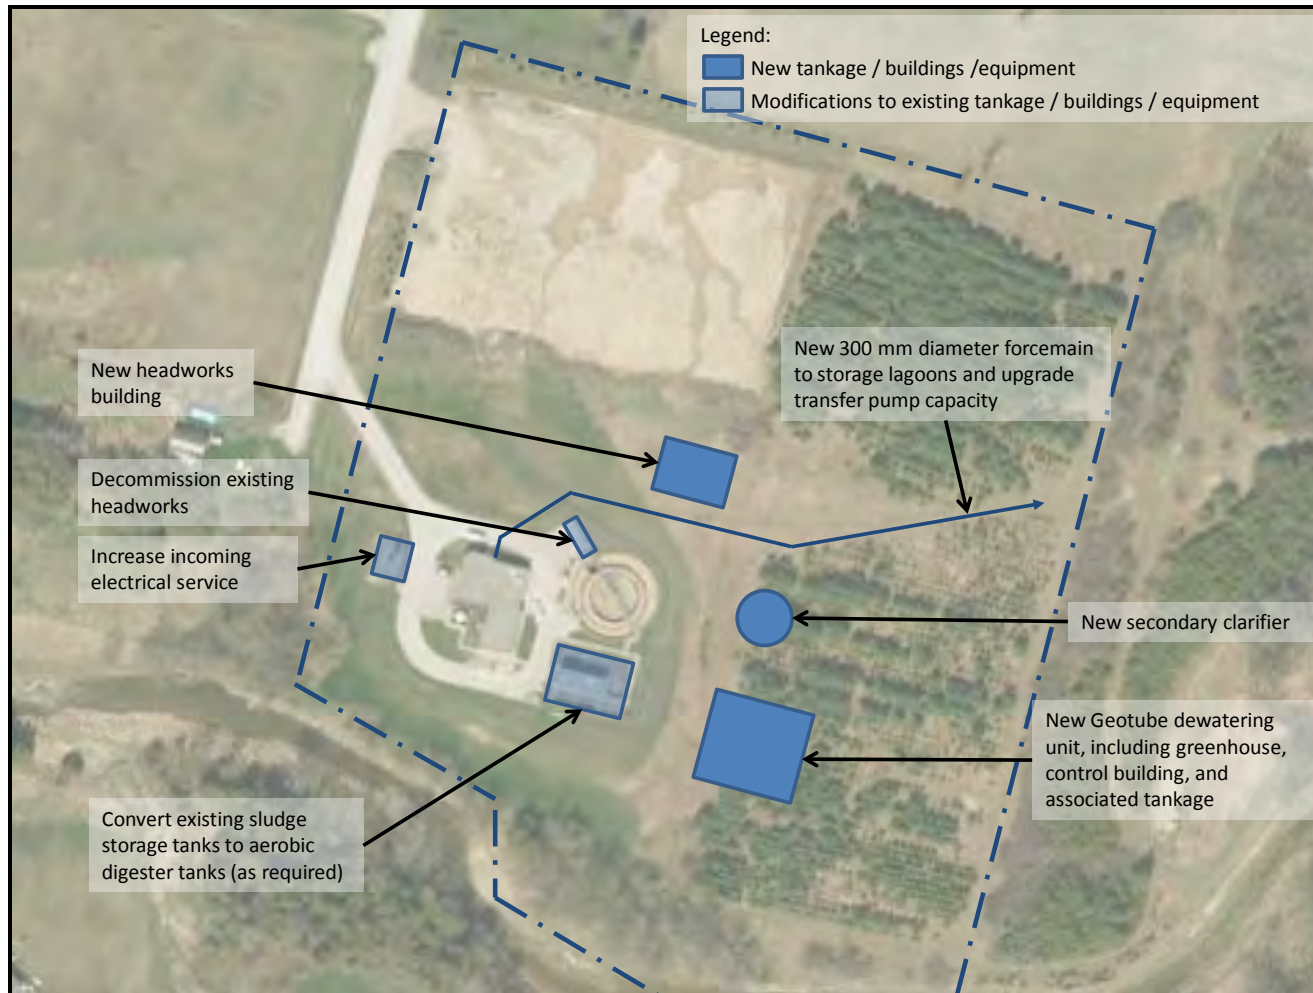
Option 1B - Construct New Secondary Clarifier with new Geotextile Dewatering and Cake Storage
